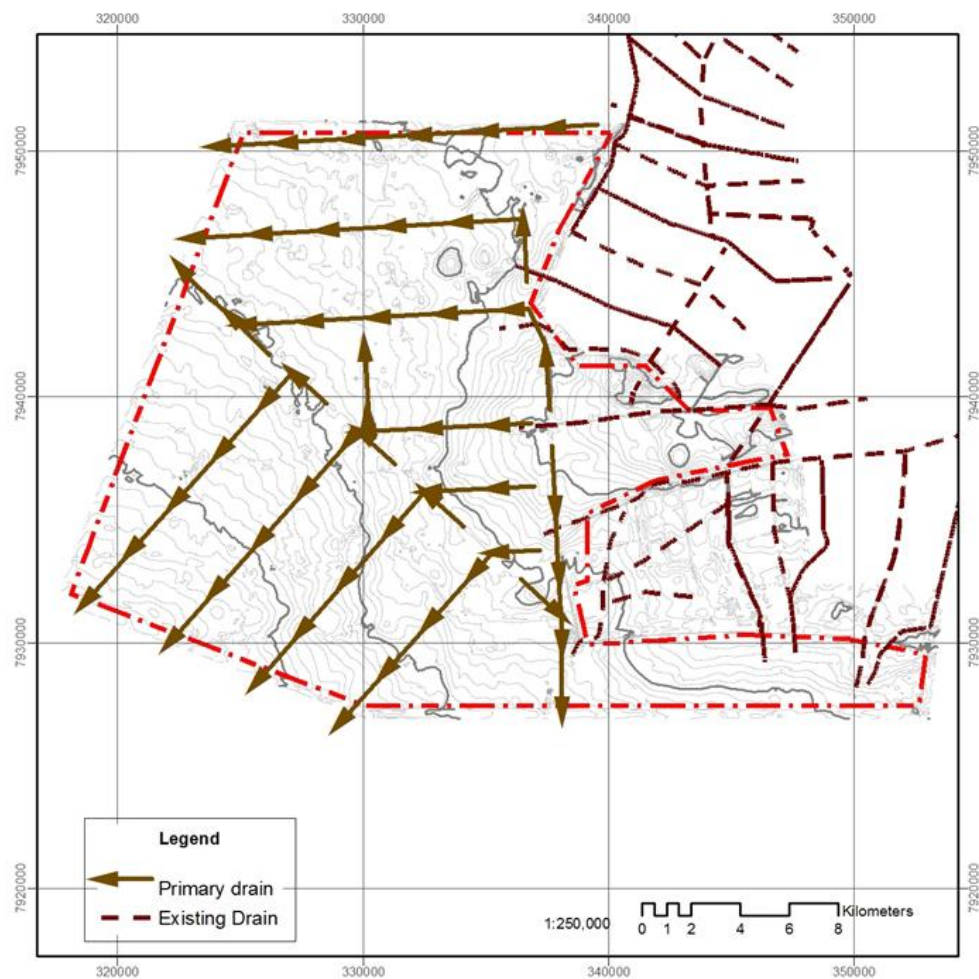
Layout of primary drains for the present design and drainage system of the existing farms
